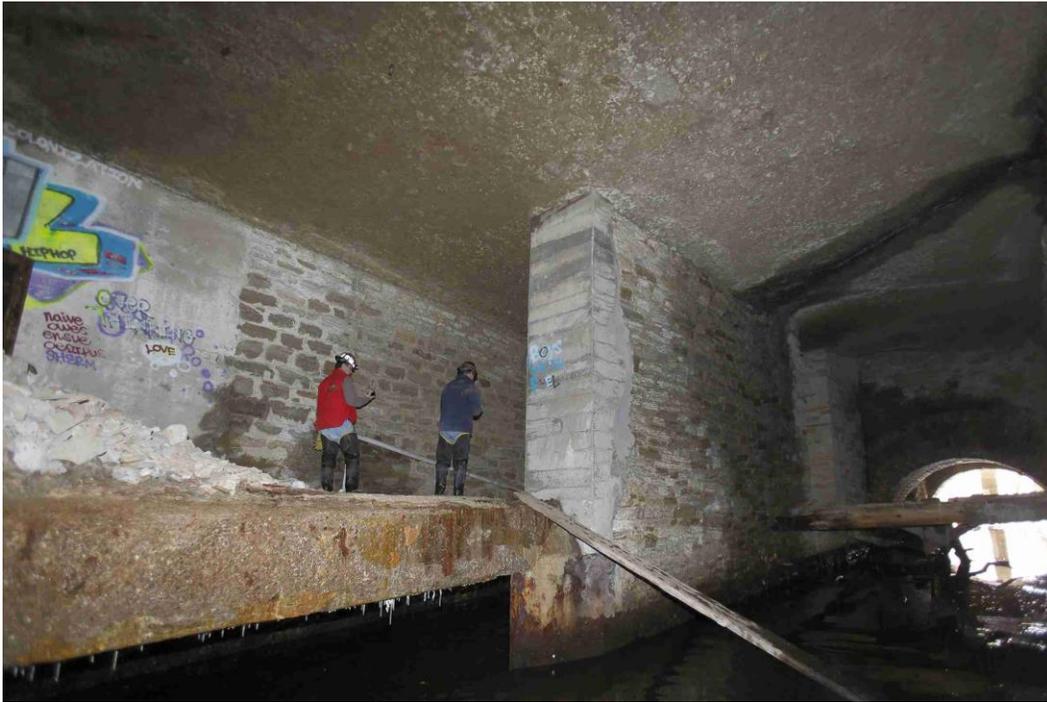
Southeast corner of the southwest downriver tailrace channel looking out towards the river.
